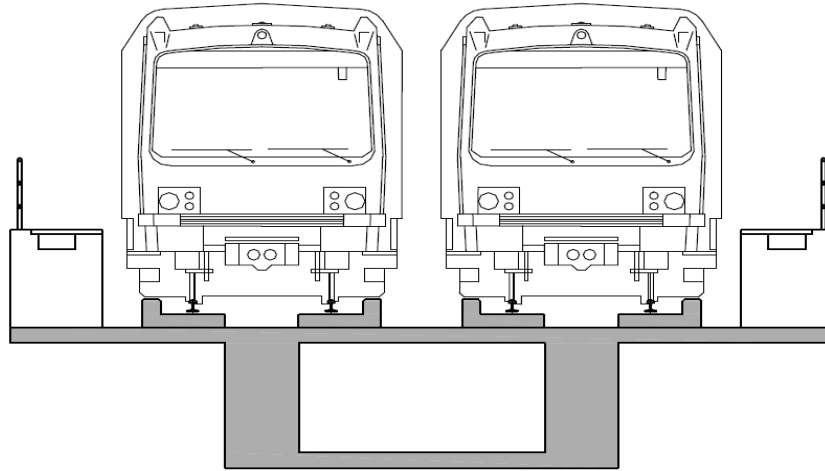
Cross-section superstructure with cast in-situ box Girder Bridge
